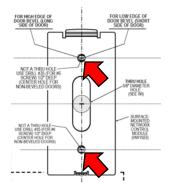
B: 7/64" PILOT HOLE ON INSIDE DOOR SURFACE FOR CONTROL UNIT PLATE
